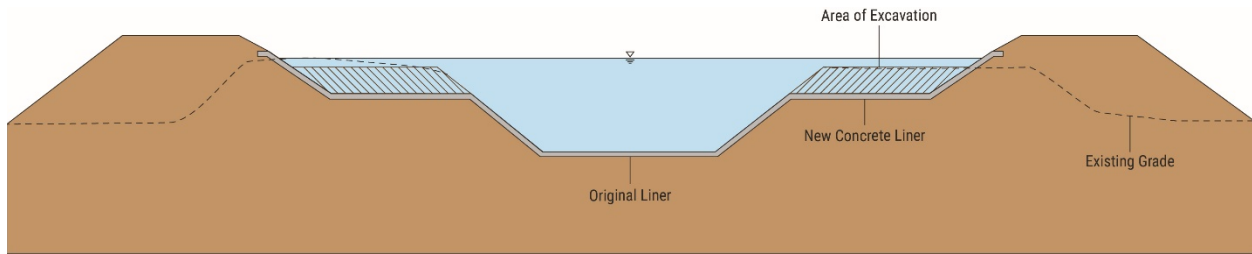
Compound Trapezoidal Cross Section in the Parallel Canal Alternative
